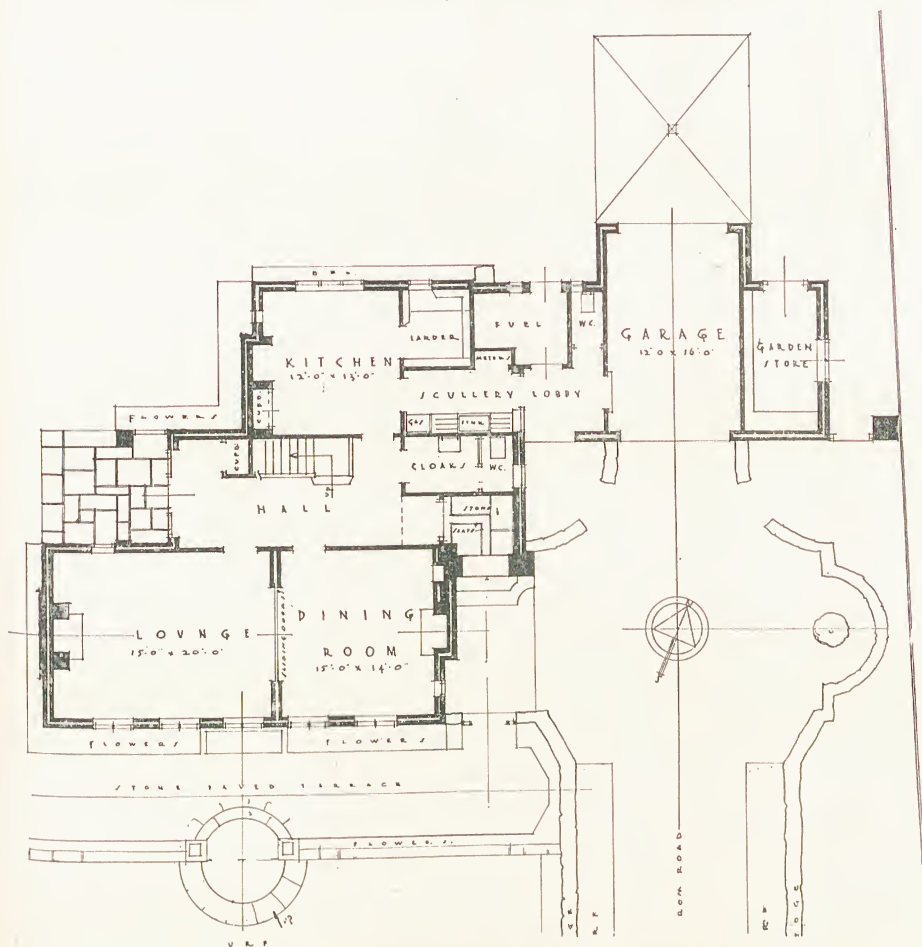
HOUSE AT HAGLEY, NEAR STOURBRIDGE, WORCESTERSHIRE—GROUND FLOOR
